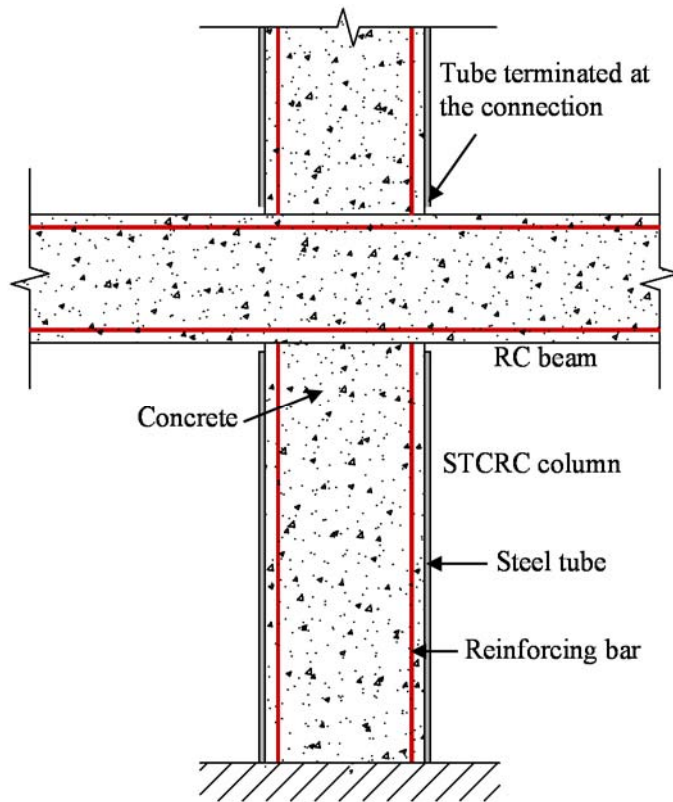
Schematic view of the STCRC column and its beam to column connection.
